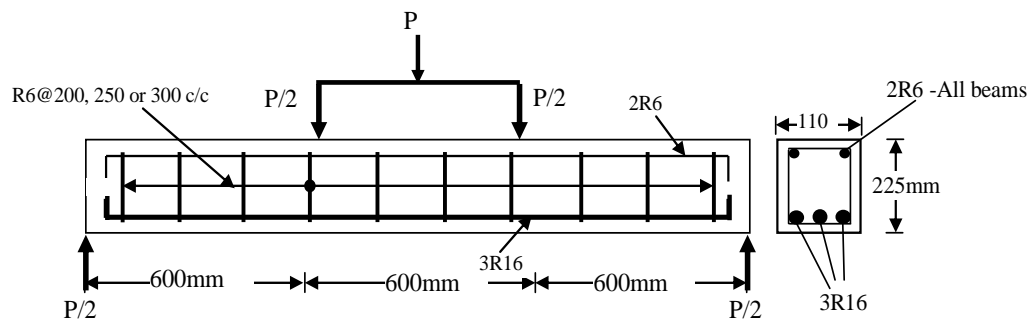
Beams with shear reinforcement (P200, P250, P300 & N200, N250, N300).
